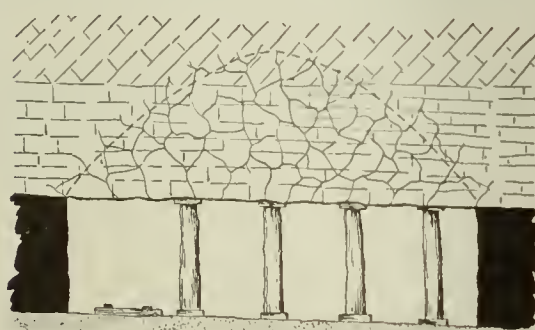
OVERARCHING OF MINE ROOF WHEN DRIVING A ROOM
